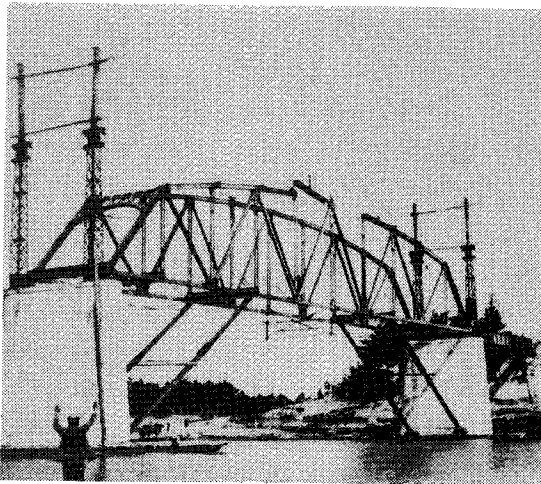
Construction of Ohta Bridge in Gifu (Completed in 1926)
